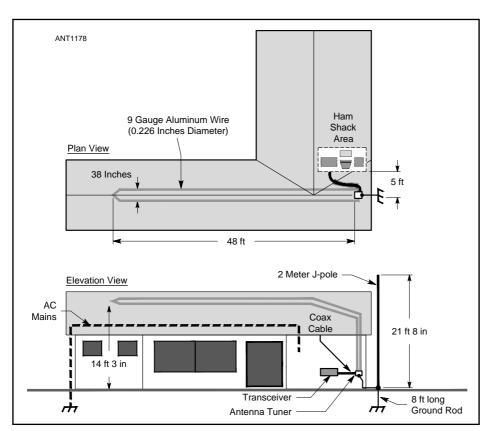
Plan and elevation views of the attic inverted L antenna.
